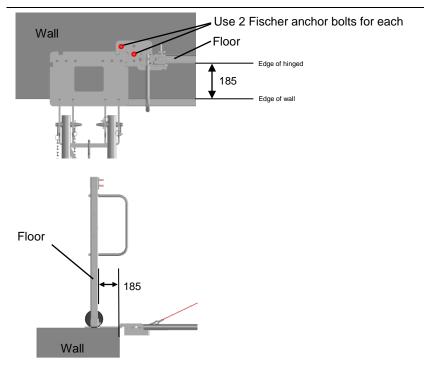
Mount pivoting floor gate to floor of the relevant storey (variant 2)
